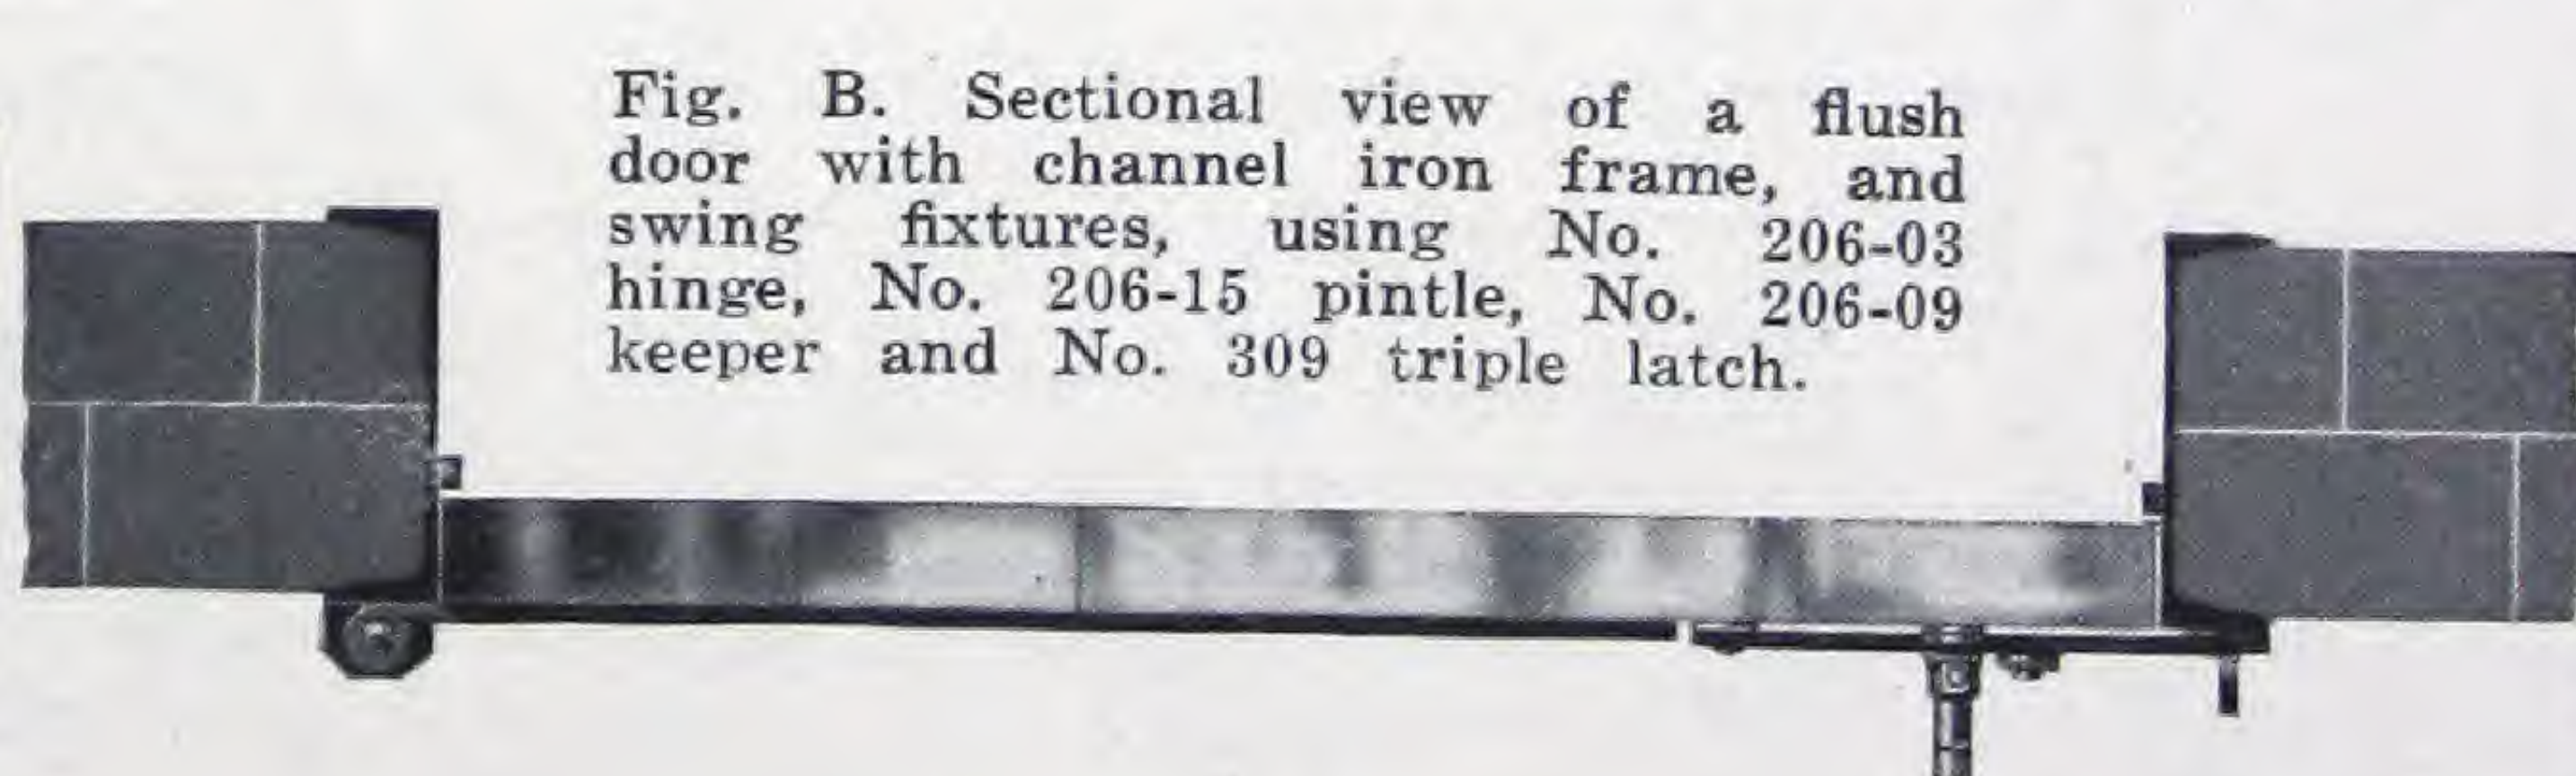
Fig. B. Sectional view of a flush door with channel iron frame, and swing fixtures, using No. 206-03 hinge, No. 206-15 pintle, No. 206-09 keeper and No. 309 triple latch.
